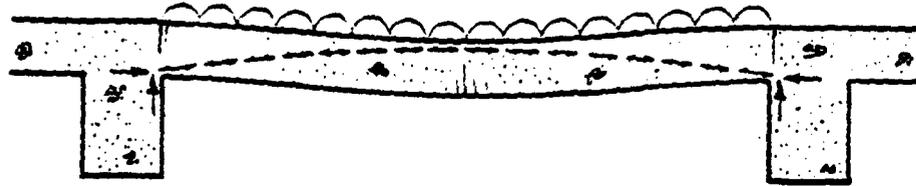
Arching Action in Restrained Reinforced Concrete Slabs
